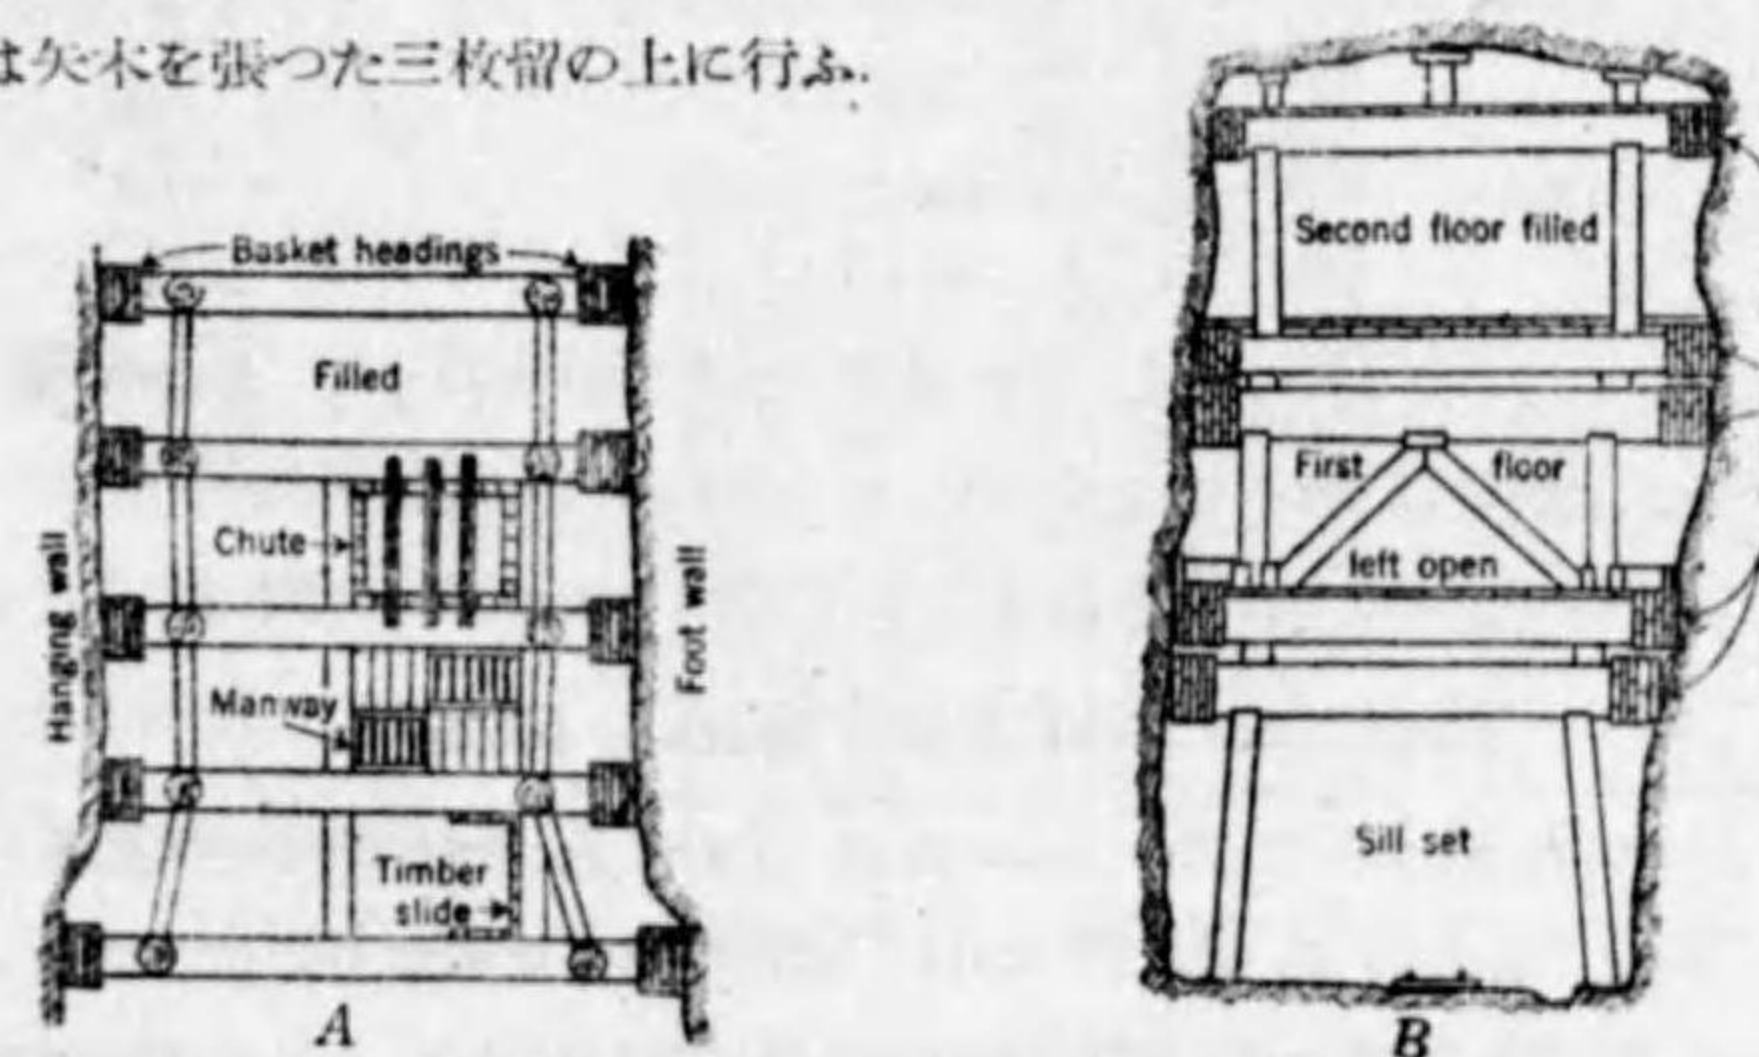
Stope timbering, Morning mine, Idaho; A, Partial plan; B, vertical cross section.
